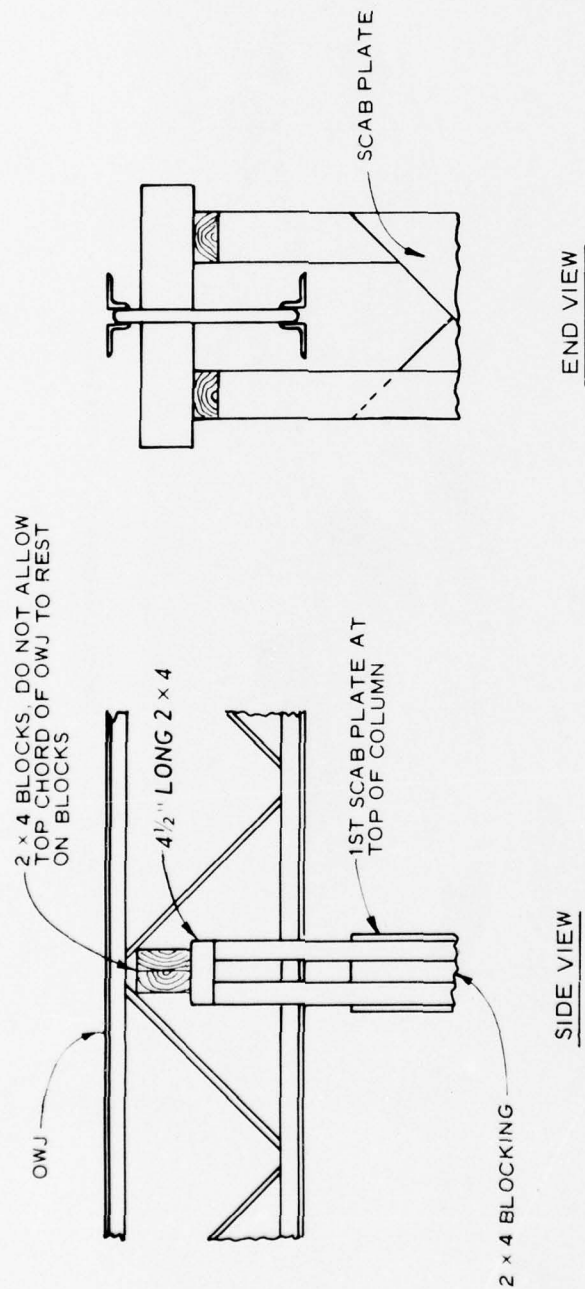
Support column and connection detail for OWJ roofs (sheet 1 of 2).
